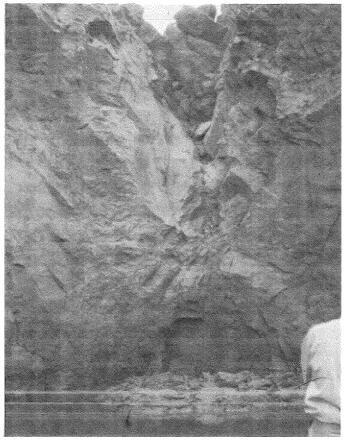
Looking upstream at faulted Pico formation in lower end of breach, December  $^1\!16$ , 1963.
